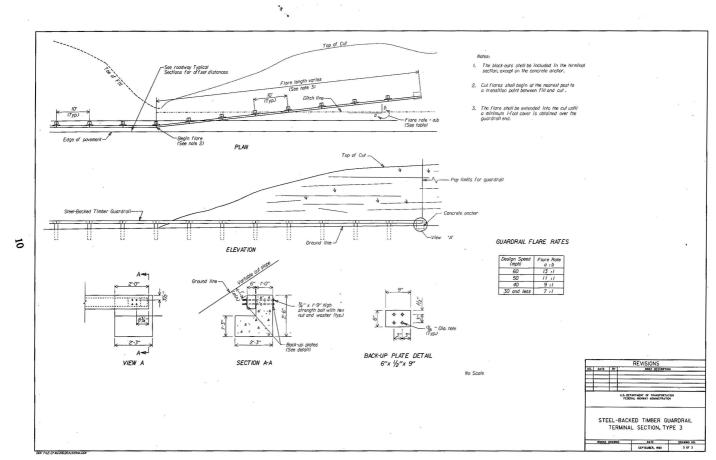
Steel-Backed Timber Guardrail -- Terminal Details (continued).
